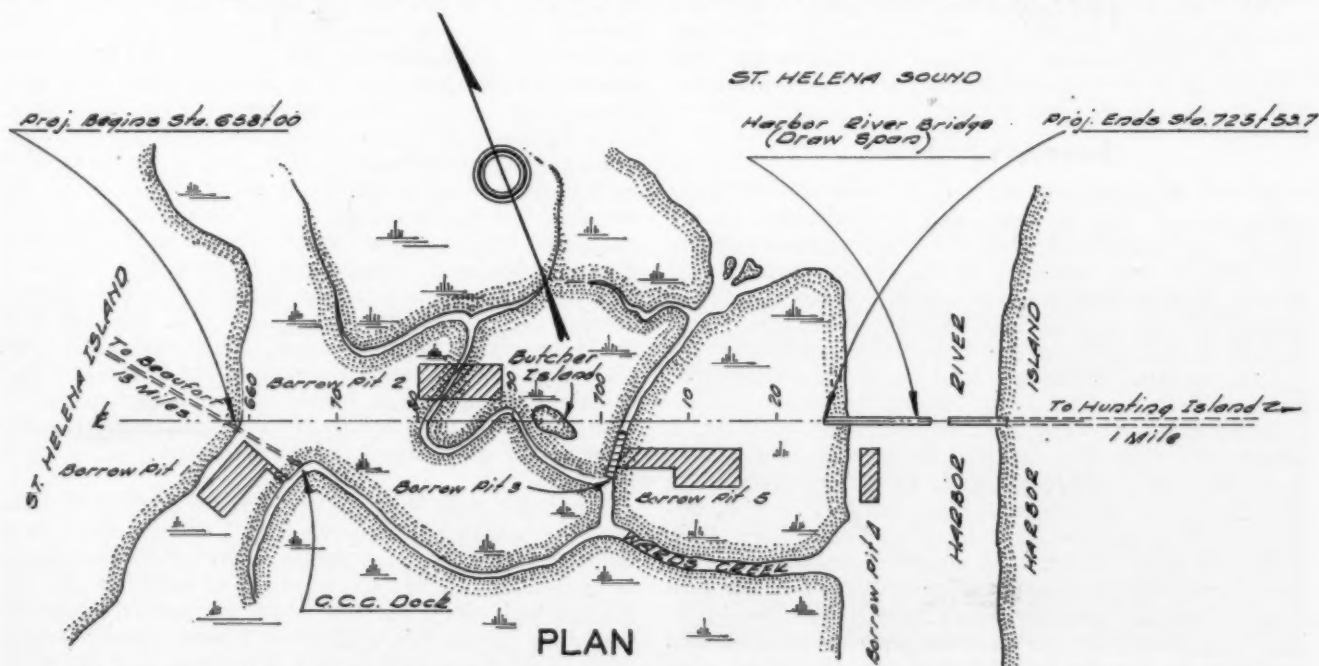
General Plan of Northwest Approach to Harbor River Bridge From St. Helena Island, Beaufort, South Carolina
